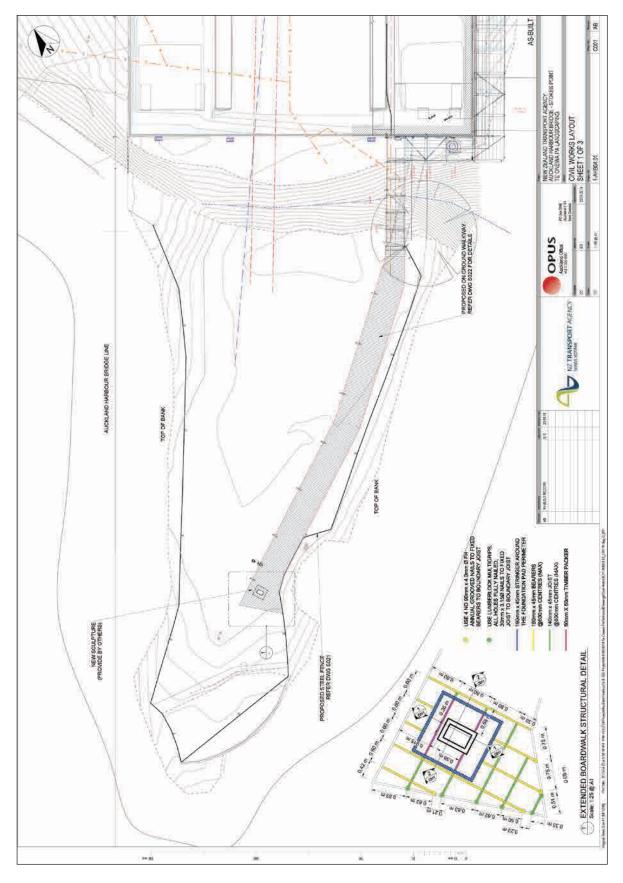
Final design of the boardwalk and refurbishment of Te Onewa.
